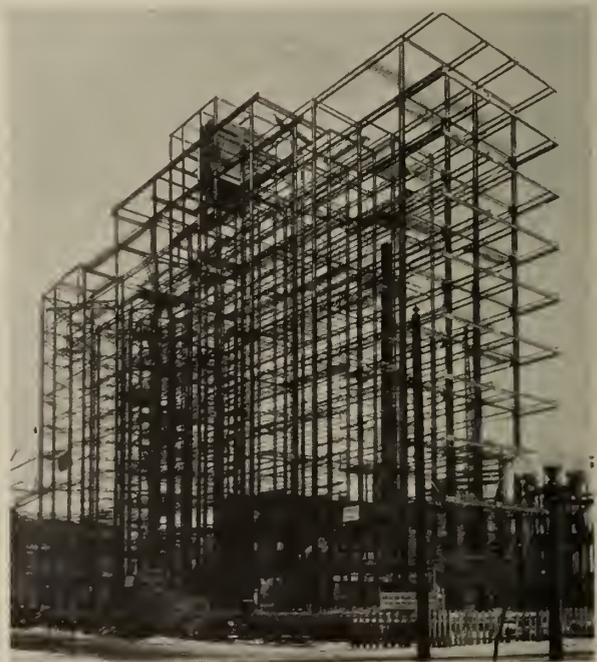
All Welded Steel Addition to Western Hospital, Montreal, Designed for Composite Construction.
